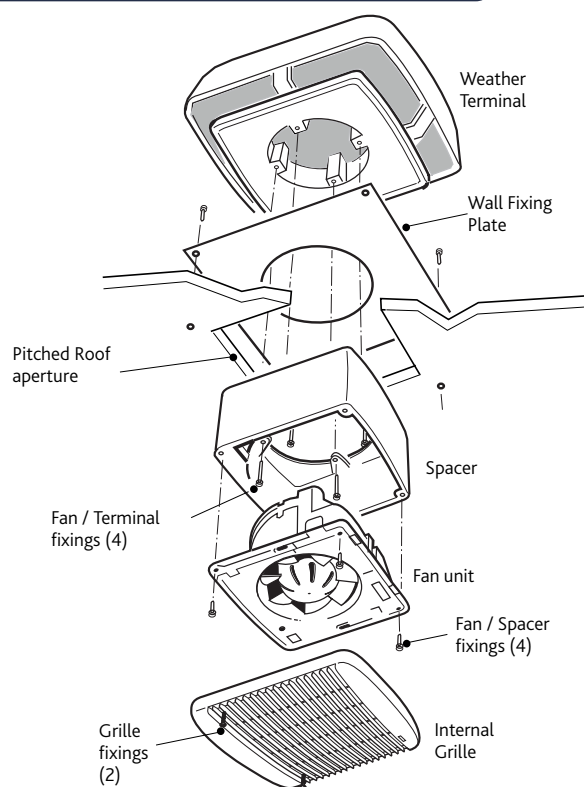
Fix the Wall Fixing Plate centrally over the roof aperture. Screws not provided.
